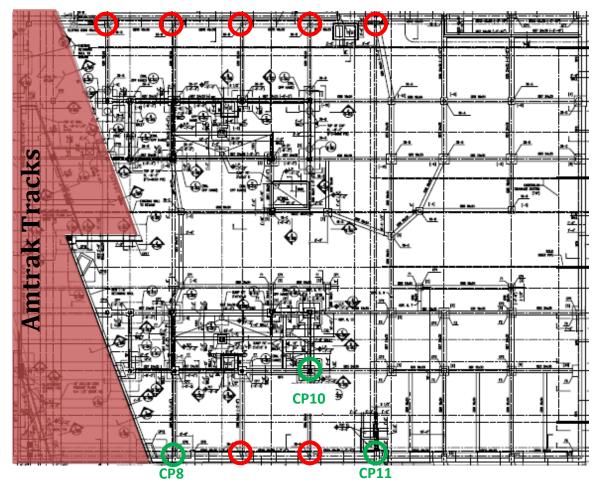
Foundation Impacts of the New Transfer System. (Red circles represent concrete caisson 18-B which must be increased in size to a 36-C. Green circles are concrete piers, which were determined to be adequate for the new transfer system.)
